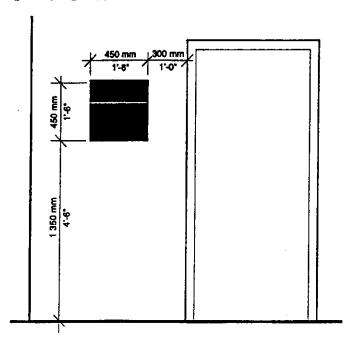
Military Building Entry Sign Type B4 Standard Layouts.
